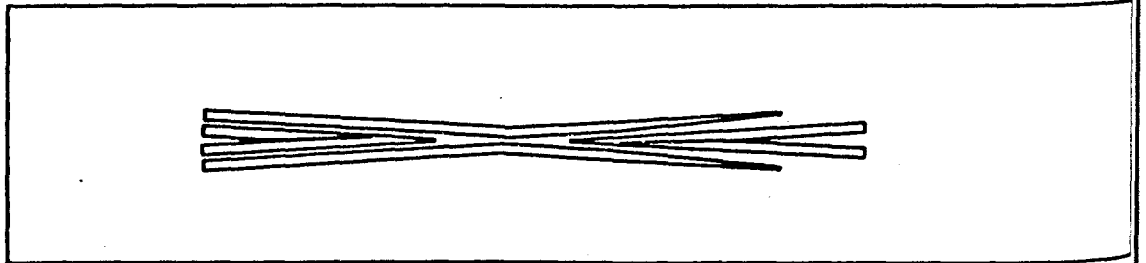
SPECIAL V CROSSING, VV CONSTRUCTION.
